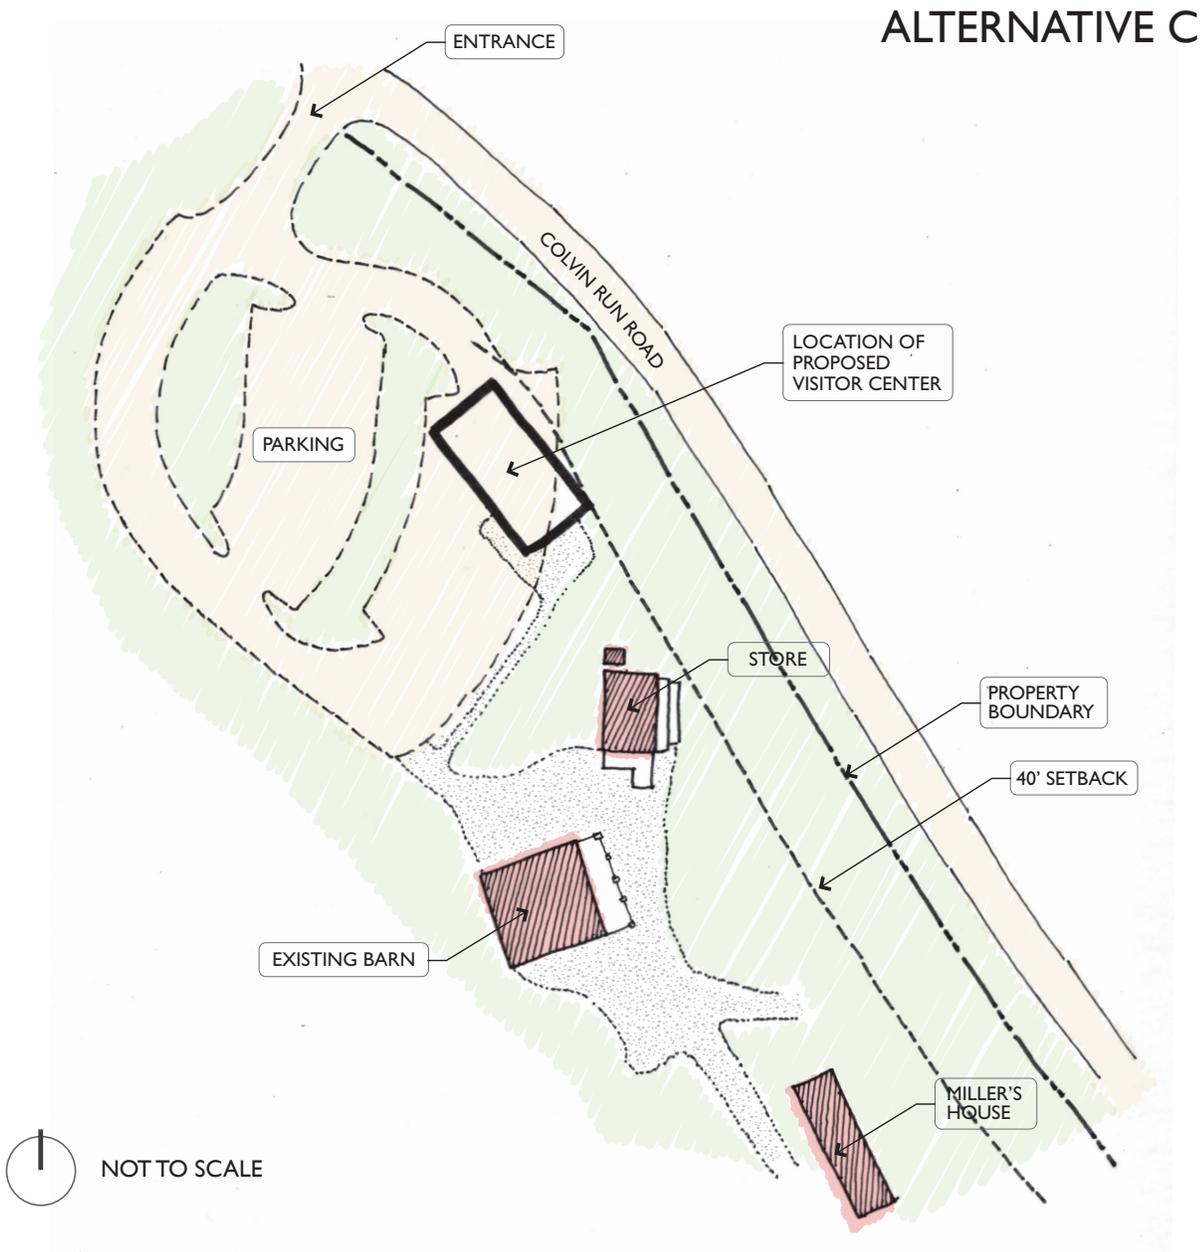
Alternative C, in which the existing barn is retained and the proposed visitor center located within space of existing parking lot. JMA, 2010.
